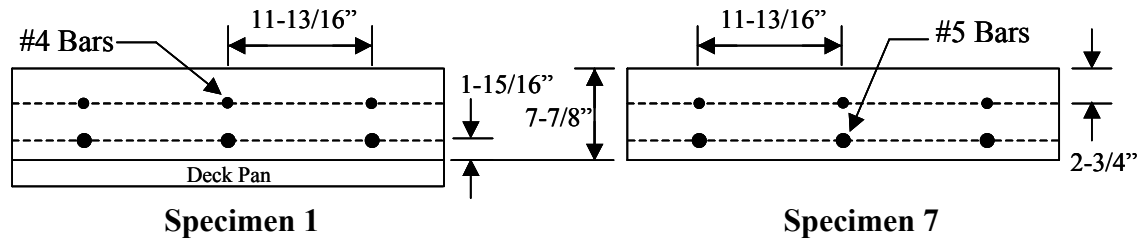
Cross Section View of the Reinforcement of Specimens 1 and 7
